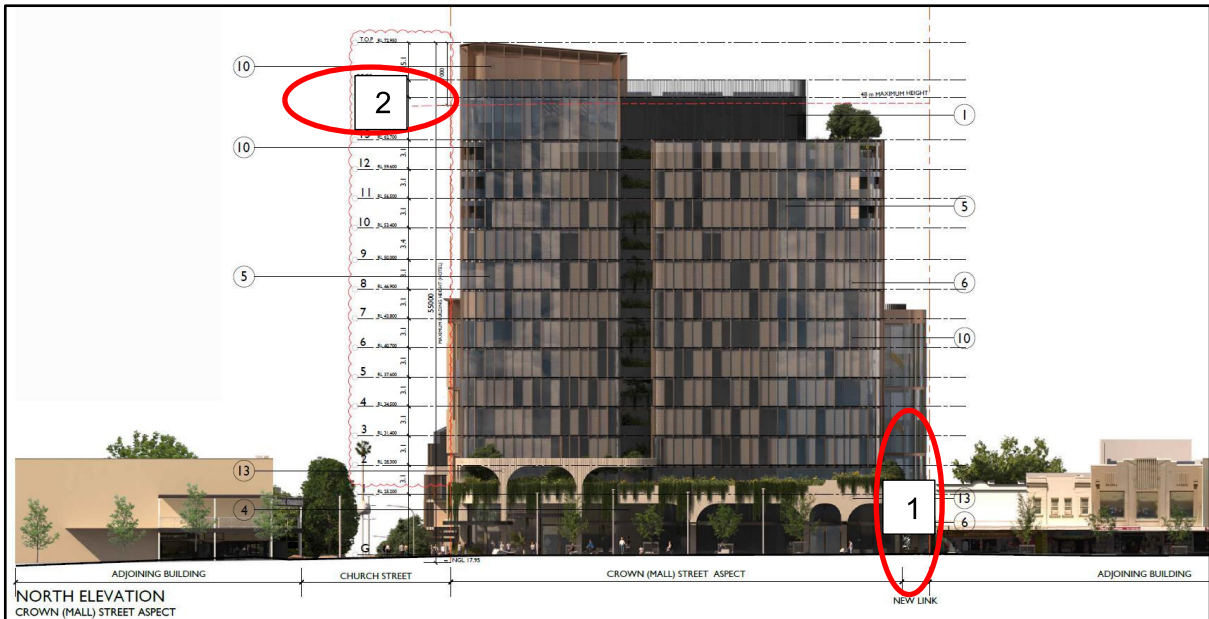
NORTH ELEVATION EXTRACT (ADM/JT)
